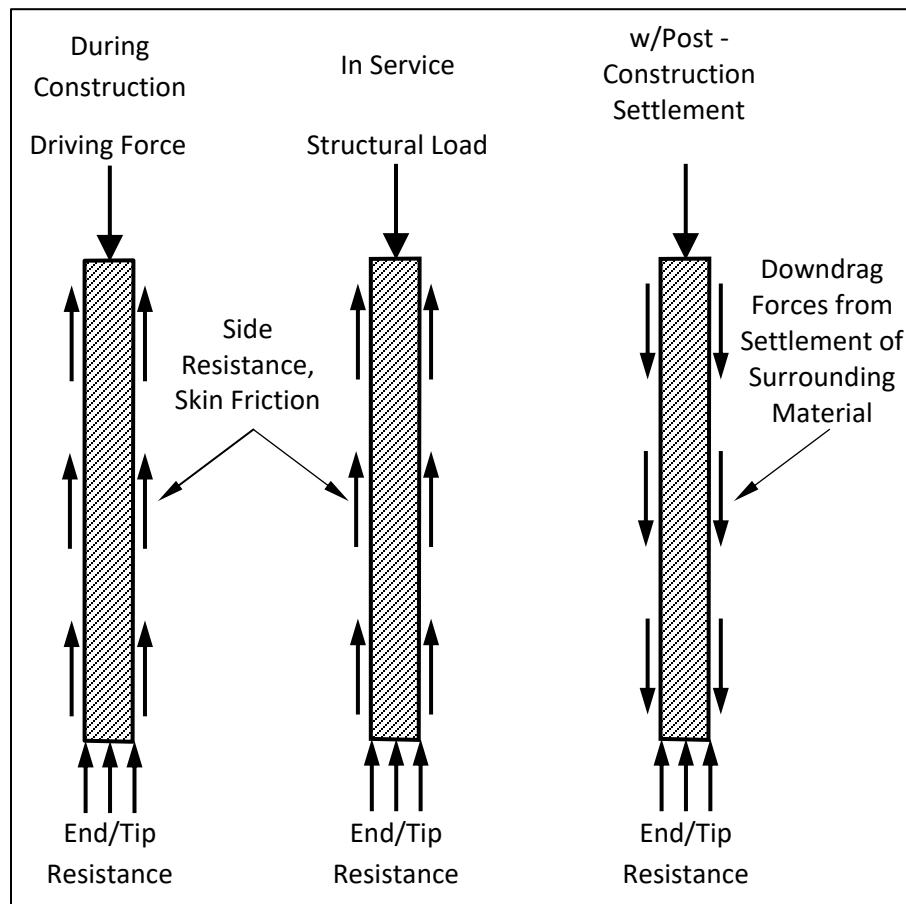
Downdrag on Piles Due to Post-Construction Settlement
